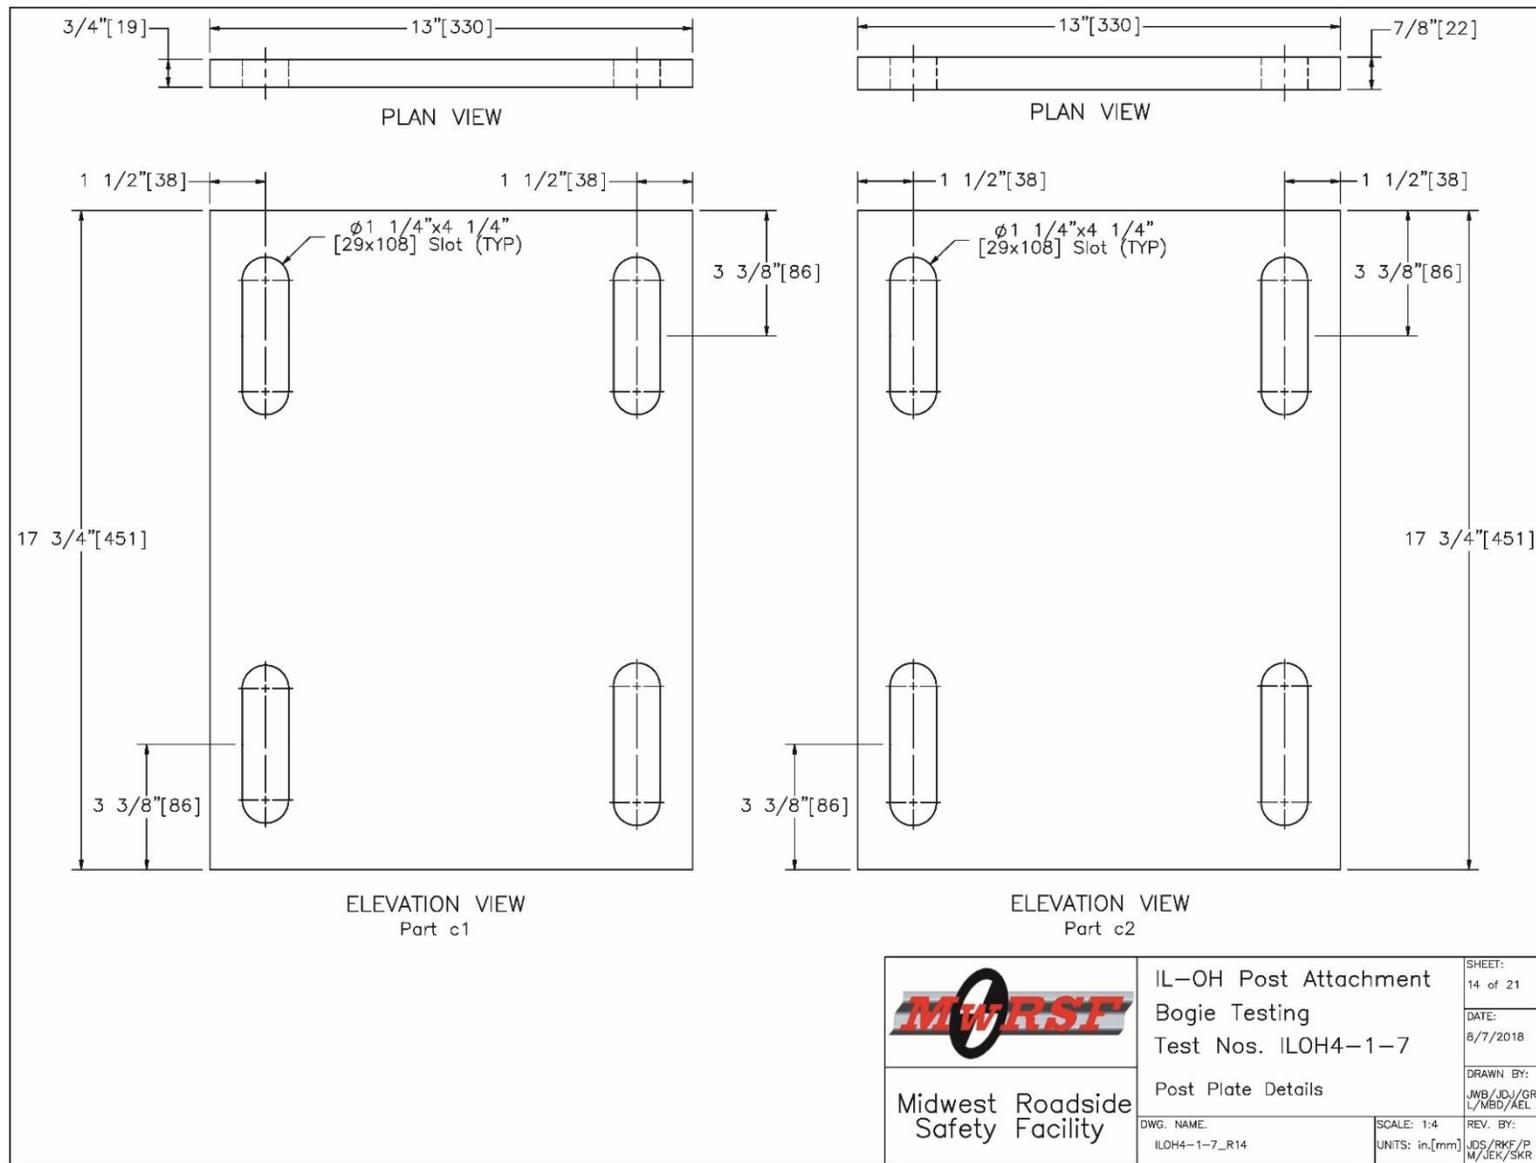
3/4-in. (19-mm) and 7/8-in. (22-mm) Singular Plate Attachment Details
